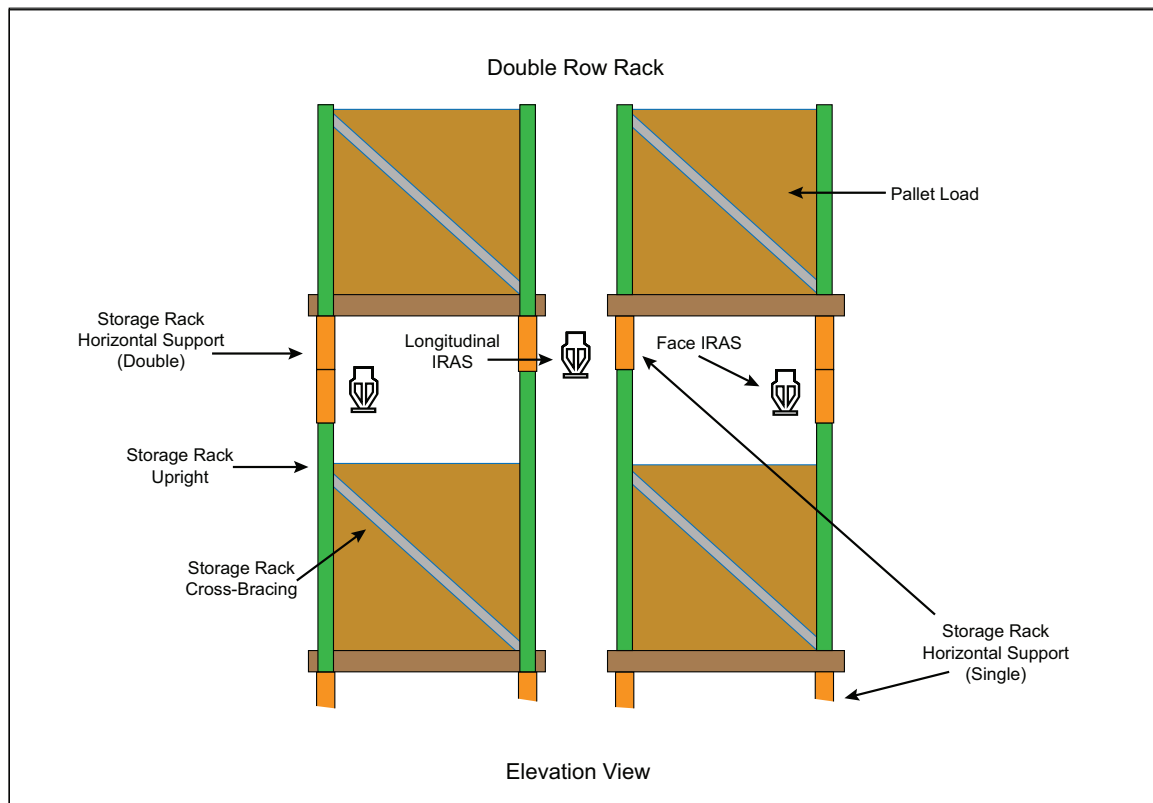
Example of protecting in-rack sprinklers and sprinkler piping in a double-row rack
